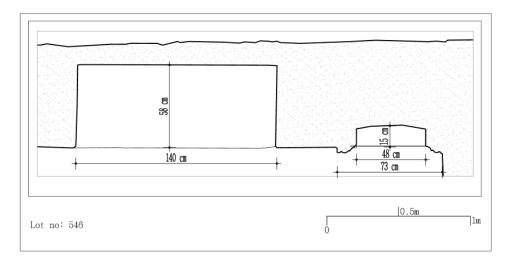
146 Orthophoto elevation and plan of yüklük and lambalık
